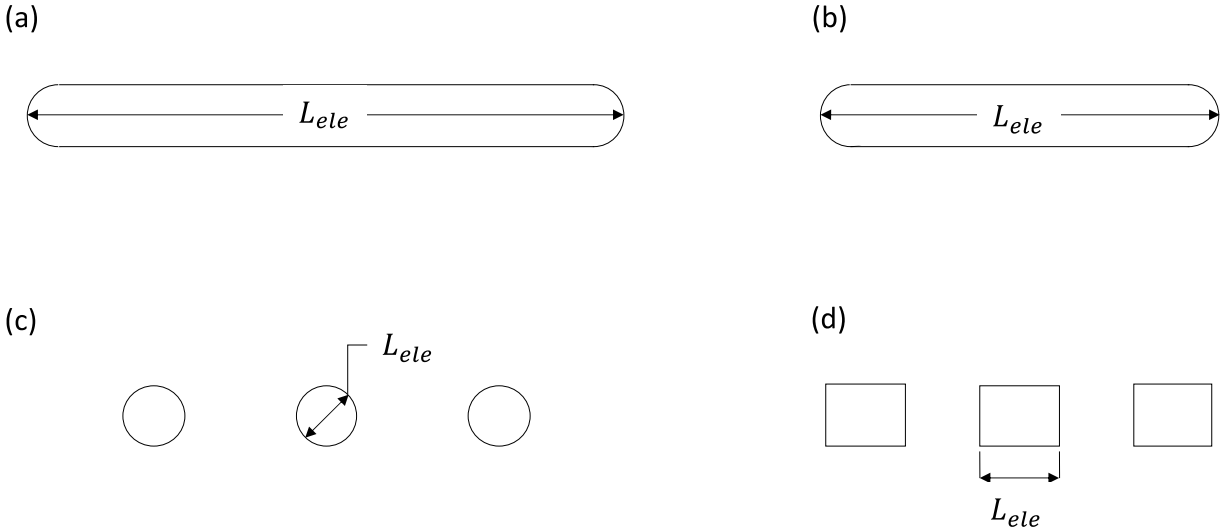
Cross-section at Base Showing Element Length Identified for (a) Walls, (b) Hammerhead Walls, (c) Circular Frame Bents, and (d) Rectangular Frame Bents
